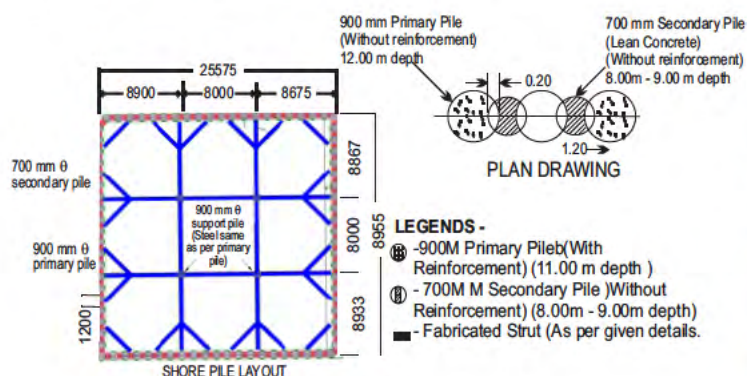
Plan and cross section of Shoring scheme with Secant piles and support struts
